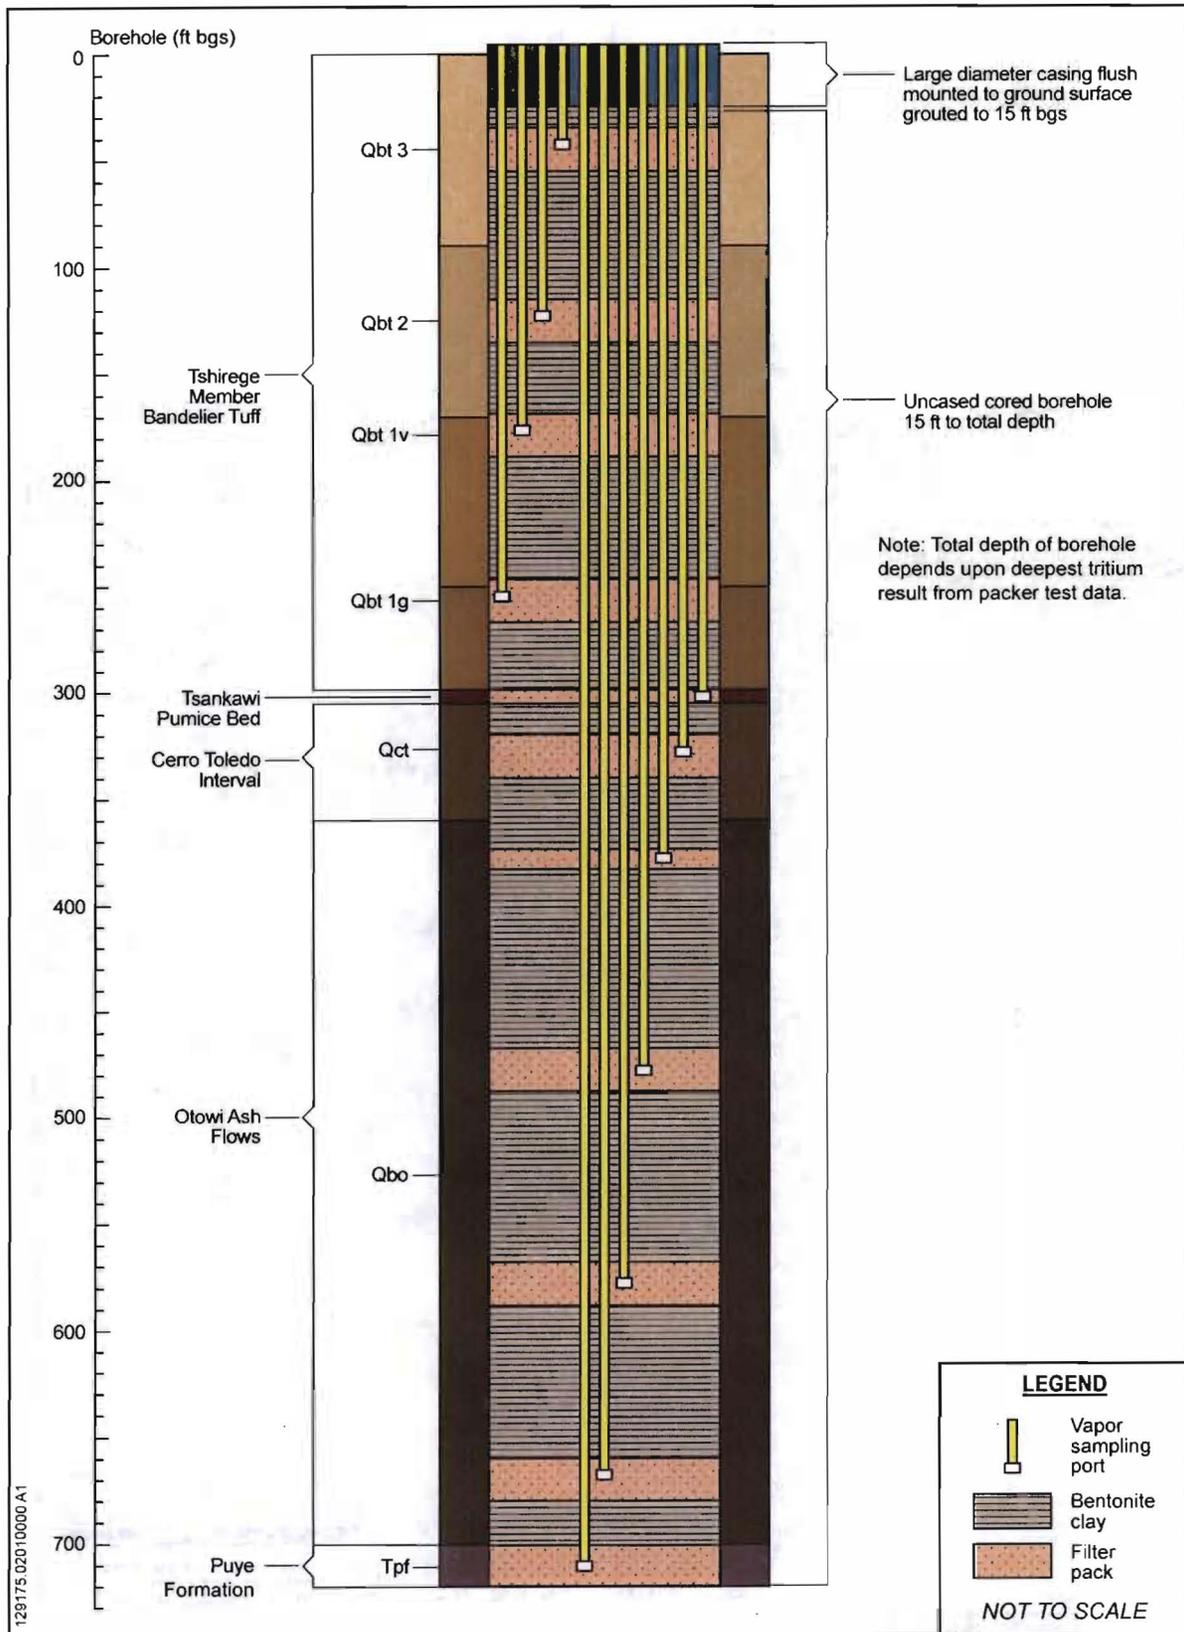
Proposed construction details of vapor-monitoring well at MDA V
